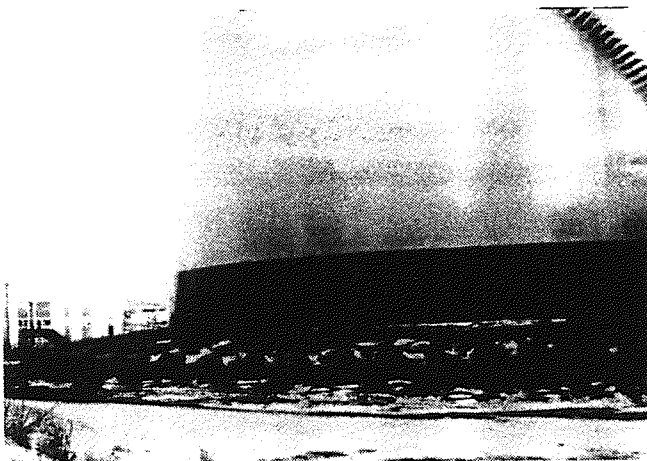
Ventiladed pad foundation showing lack of attention to seasonal installation and removal of vent pipe caps.
